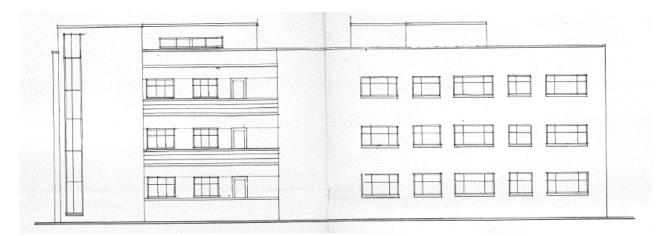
West elevation, from plans related to Building Permit U1174 (M Benshemesh, 1951) (Source: Council Building File)
